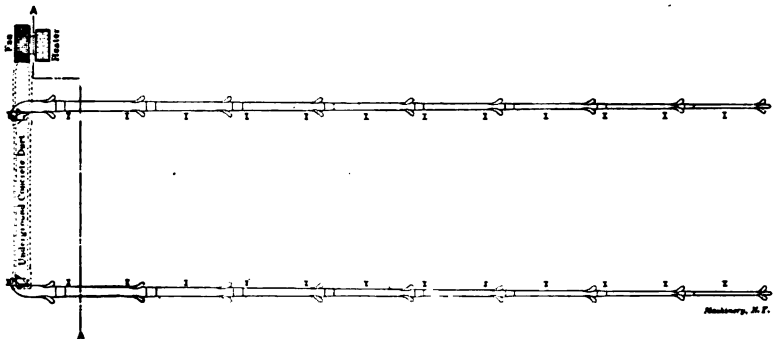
Plan of Heating and Ventilating System of the Houston, Stanwood & Gamble Company, Covington, Kentucky
